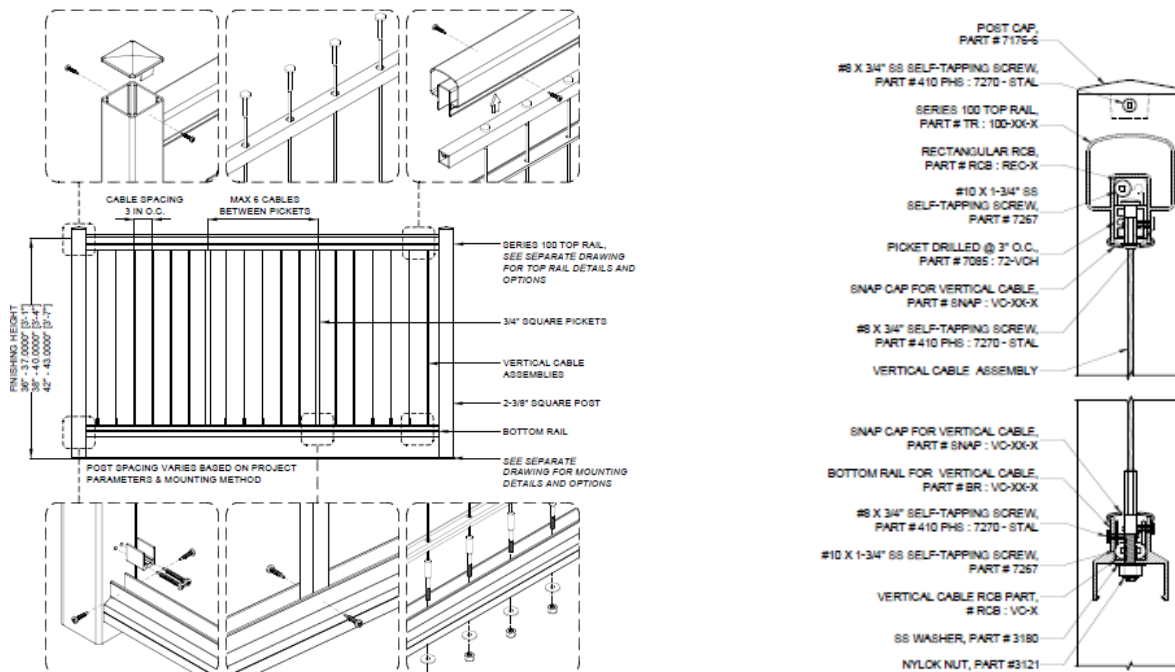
Series 100 and 150 Vertical Cable Infill Assembly (Series 100 shown)
